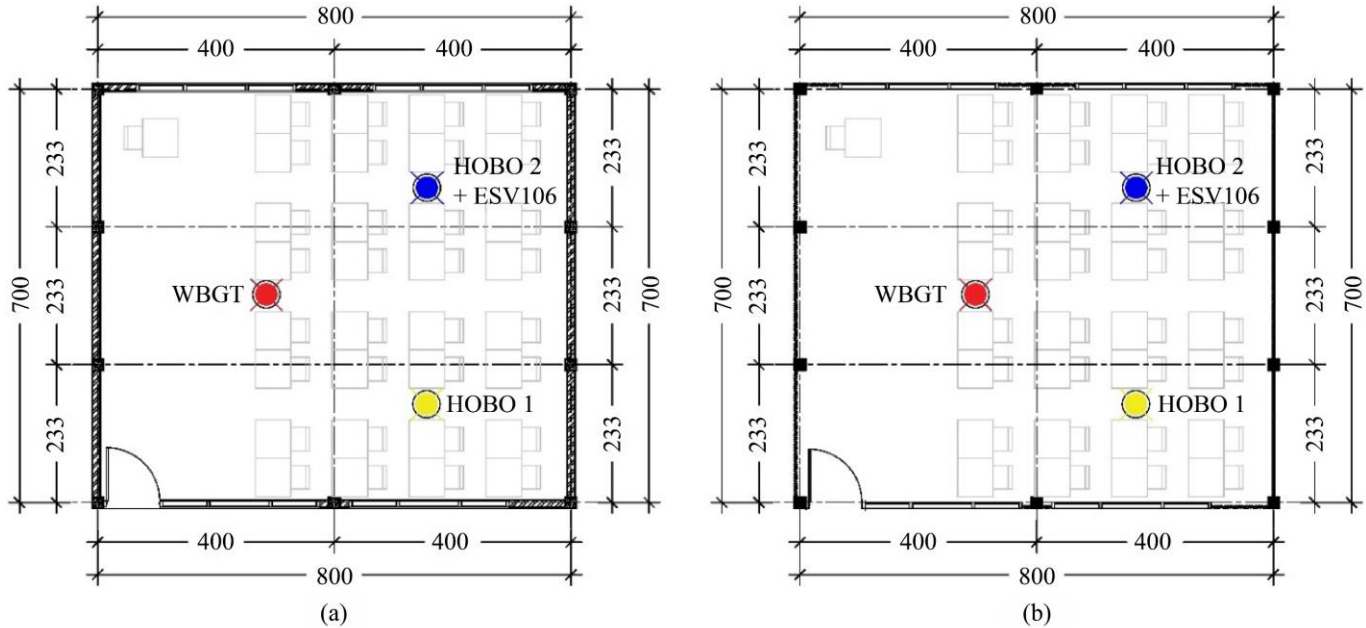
Instrument points: (a) Brick-walled classroom, and (b) Wooden-walled classroom.
